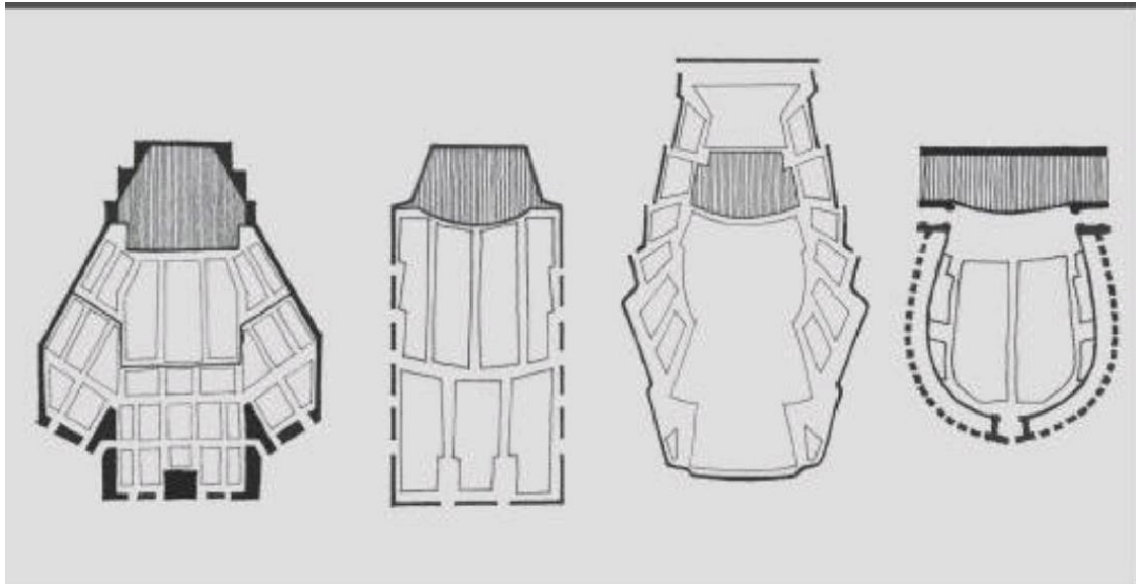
floor plans. Left to right; NHK Hall – Tokyo, Symphony Hall – Boston, Concert Hall of the Sydney Opera House, and *Teatro Alla Scala* – Milan
